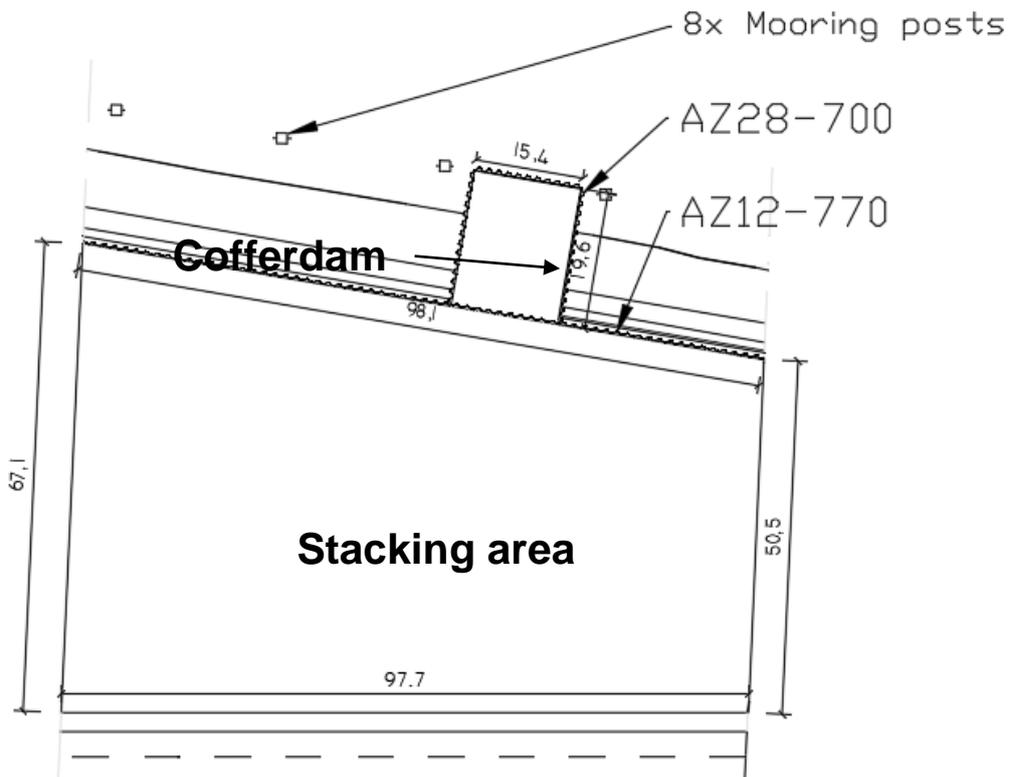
Layout of the terminal solution 'Cofferdam at embankment'. All units in meter
